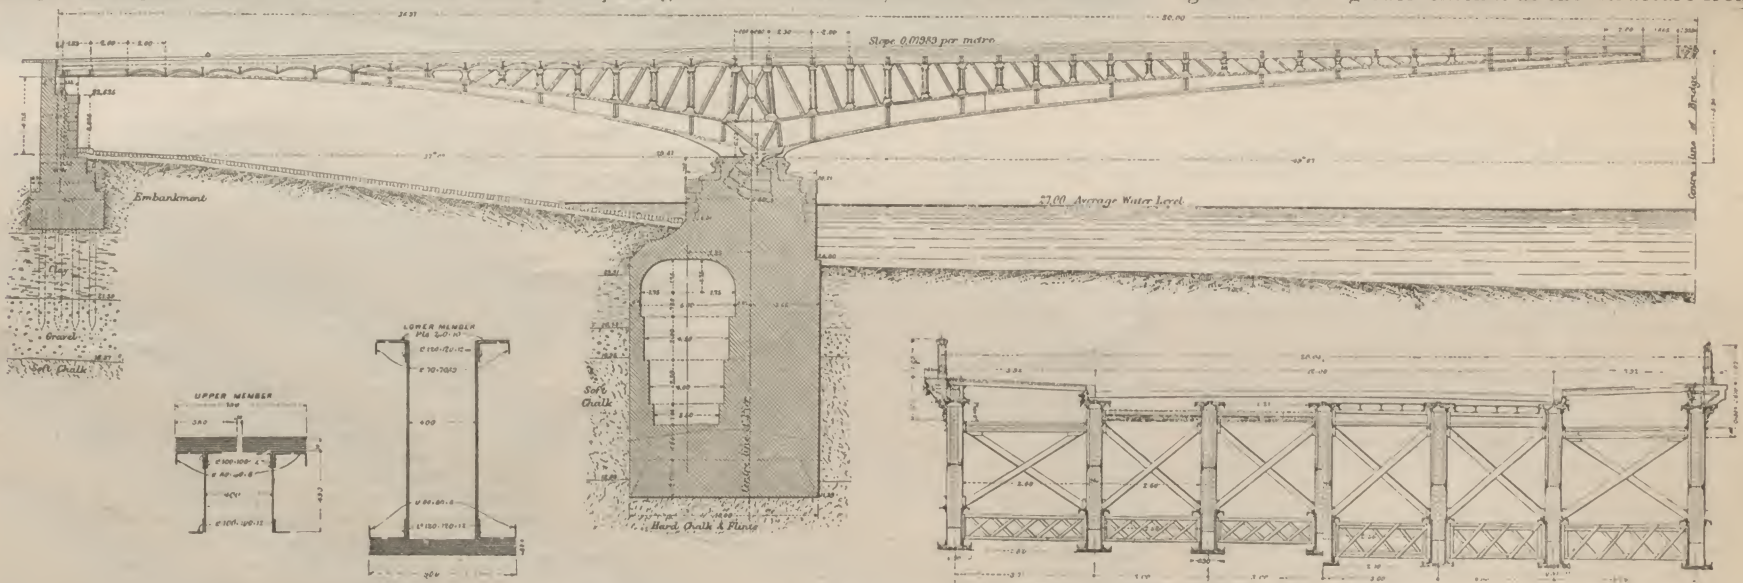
PIER PIVOT AND CONNECTIONS AT CENTER AND ABUTMENTS.
